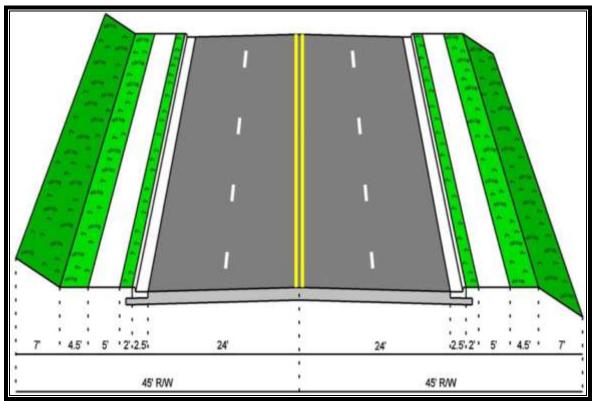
4-Lane, Undivided, Curb & Gutter, Sidewalks (Both Sides)
